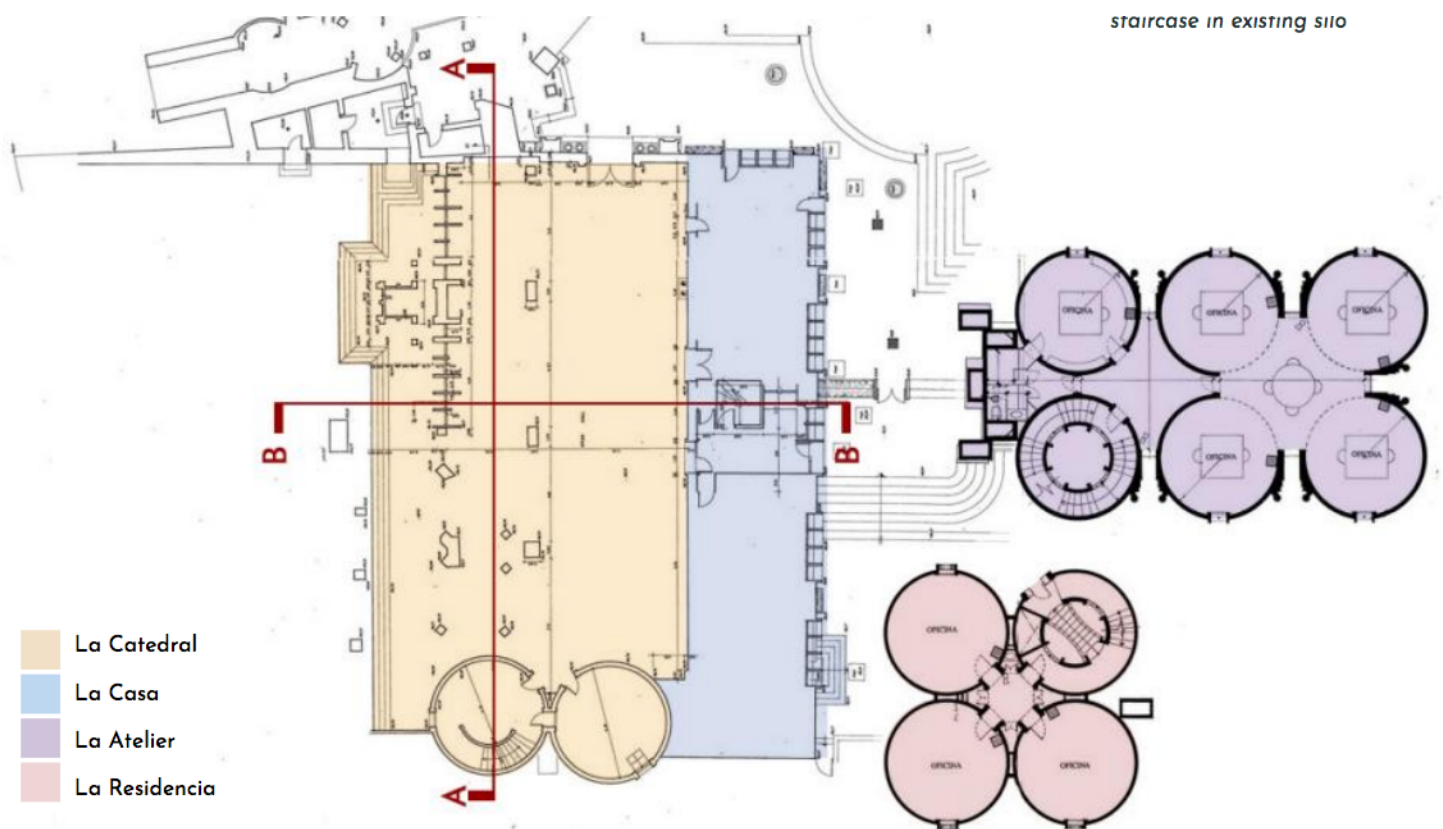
Ground Floor Plan of La Fabrica showing zoning of spaces
